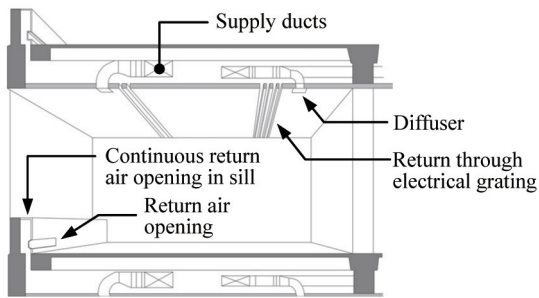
A Cross Section Perspective of Air Conditioning Ducts Incorporated into a Mezzanine Ceiling and a Curtain Wall Windowsill
